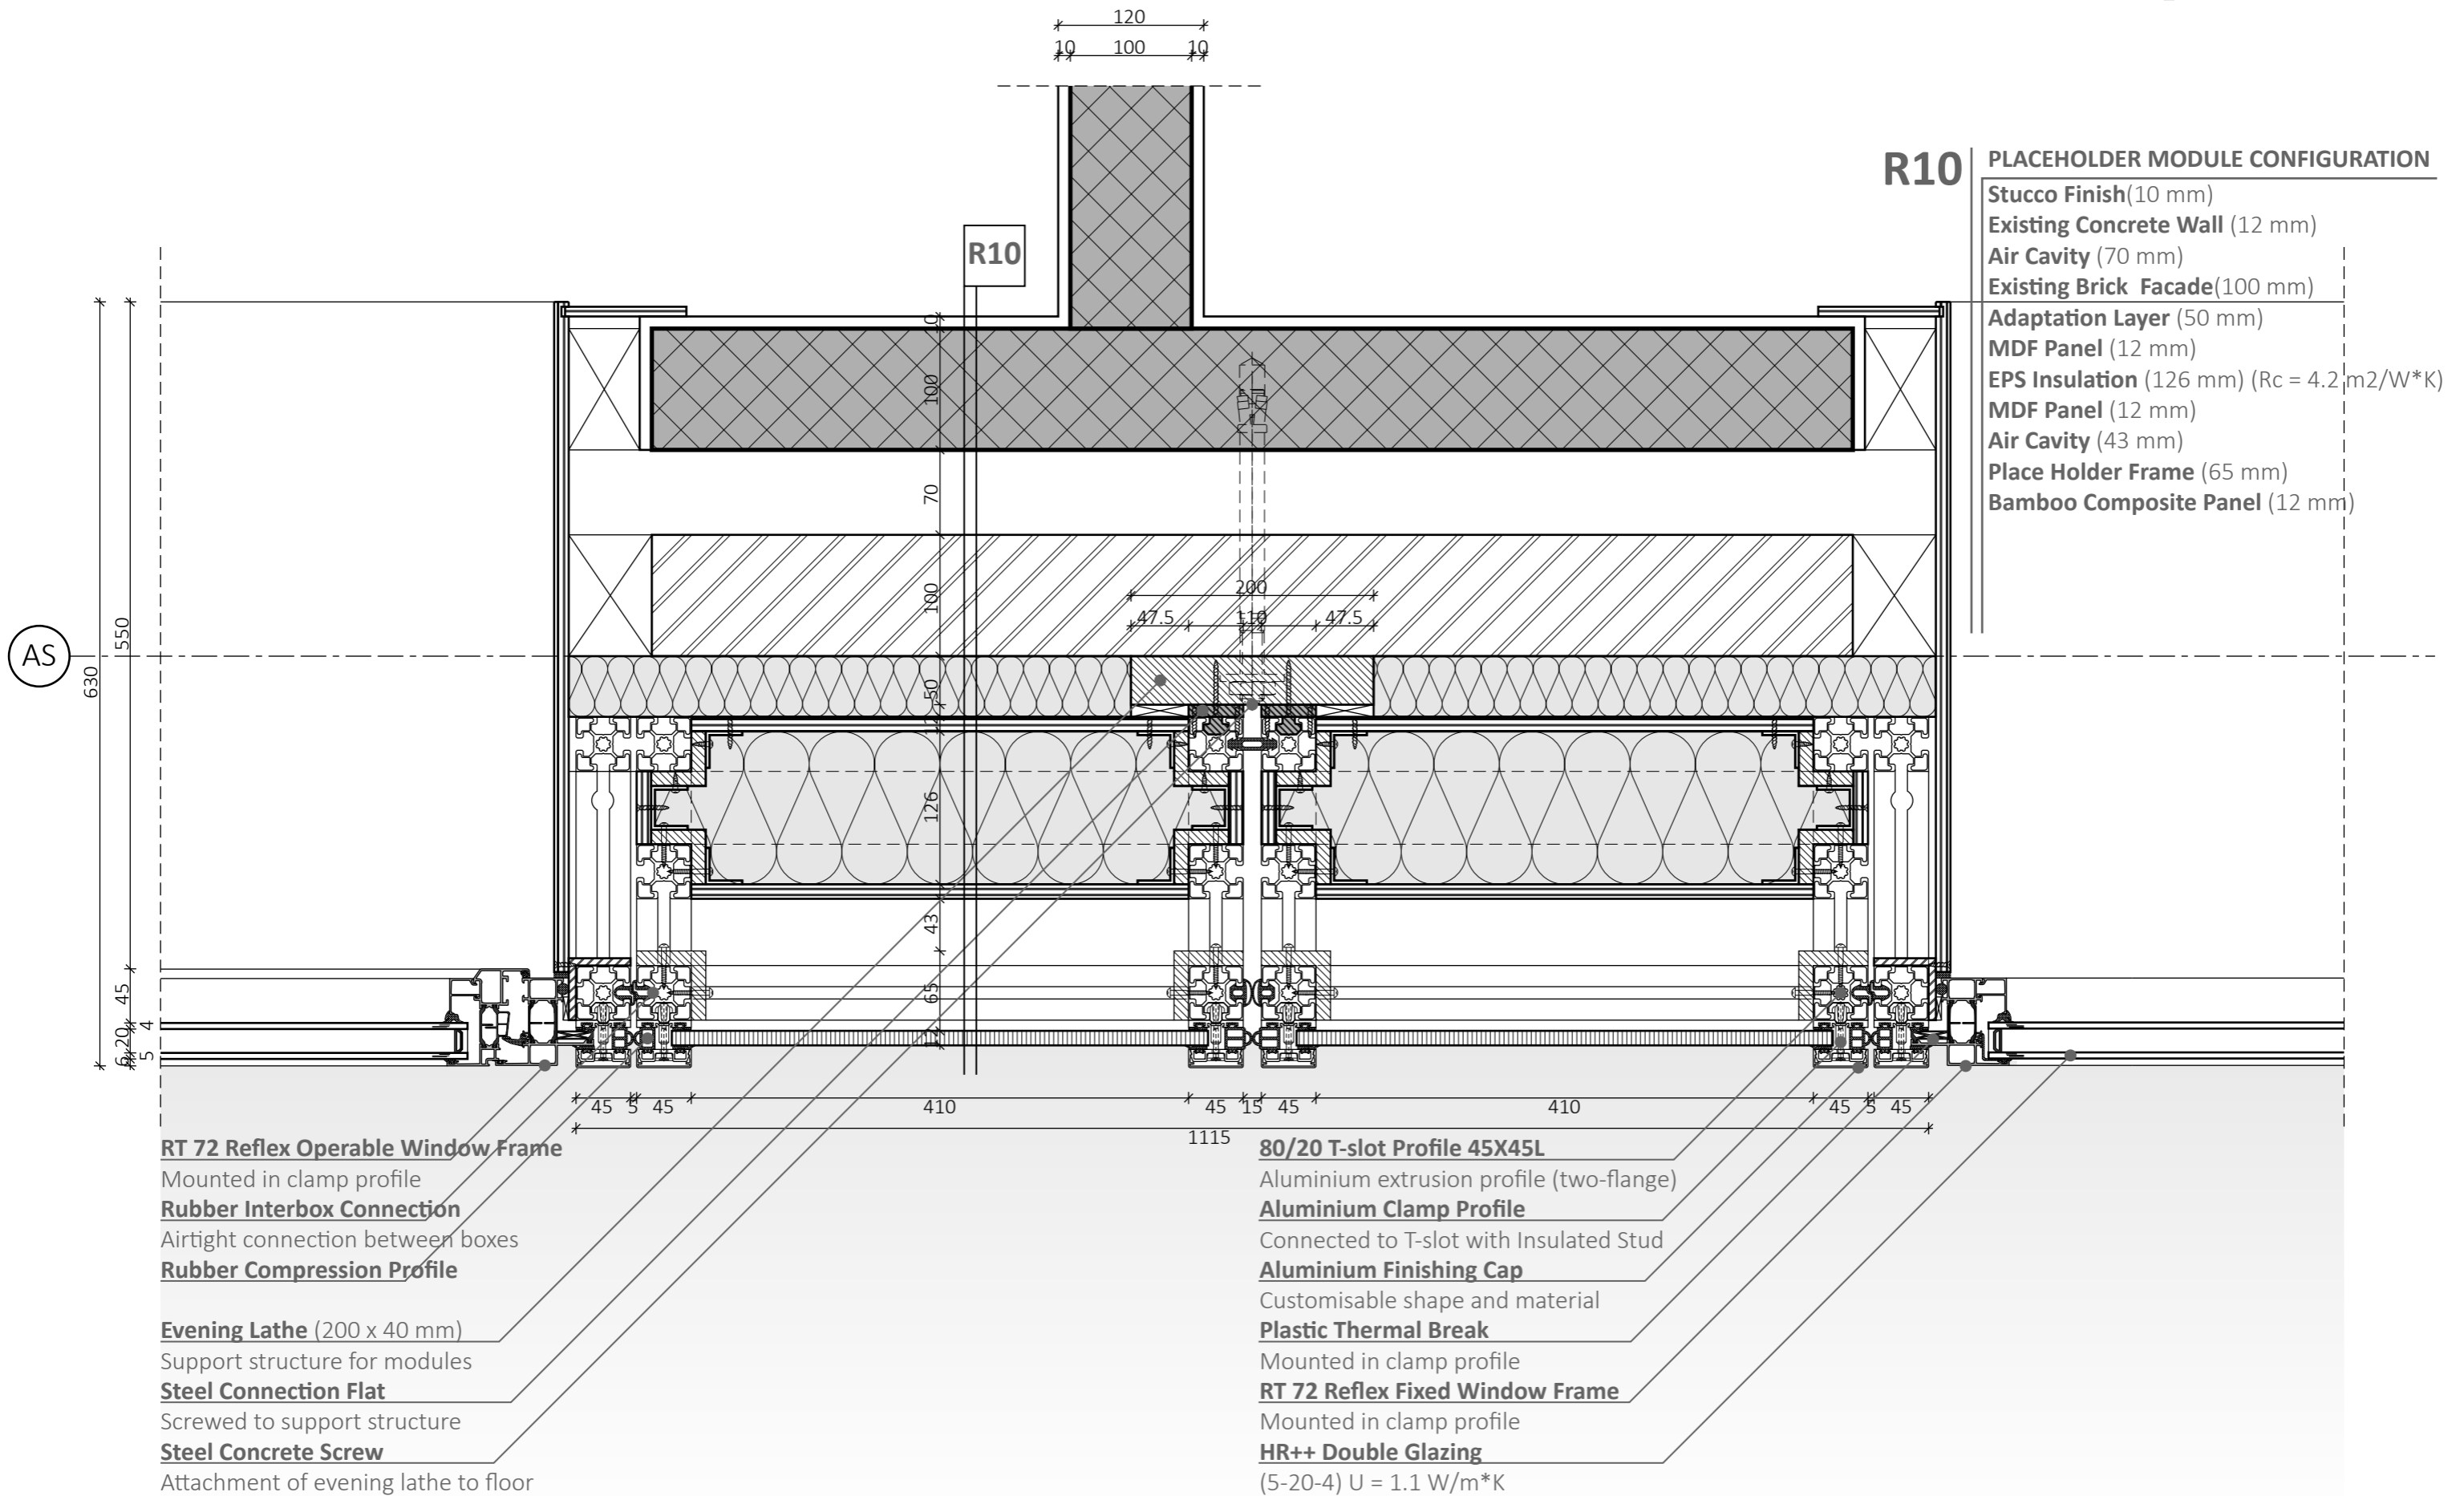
Detail | 1:5 | Horizontal | Placeholder Frame
